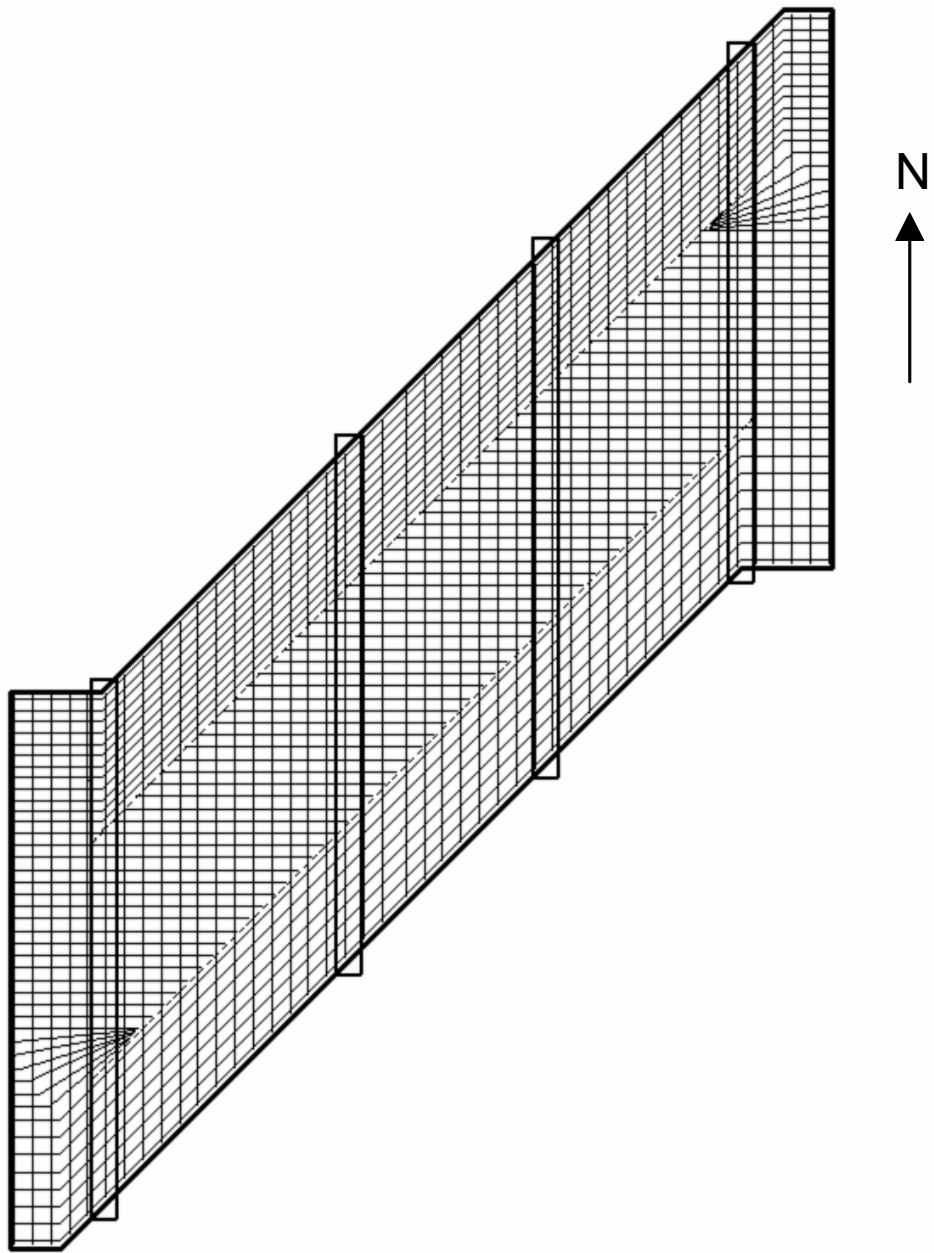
45° skew specimen slab reinforcement, top and bottom mats
